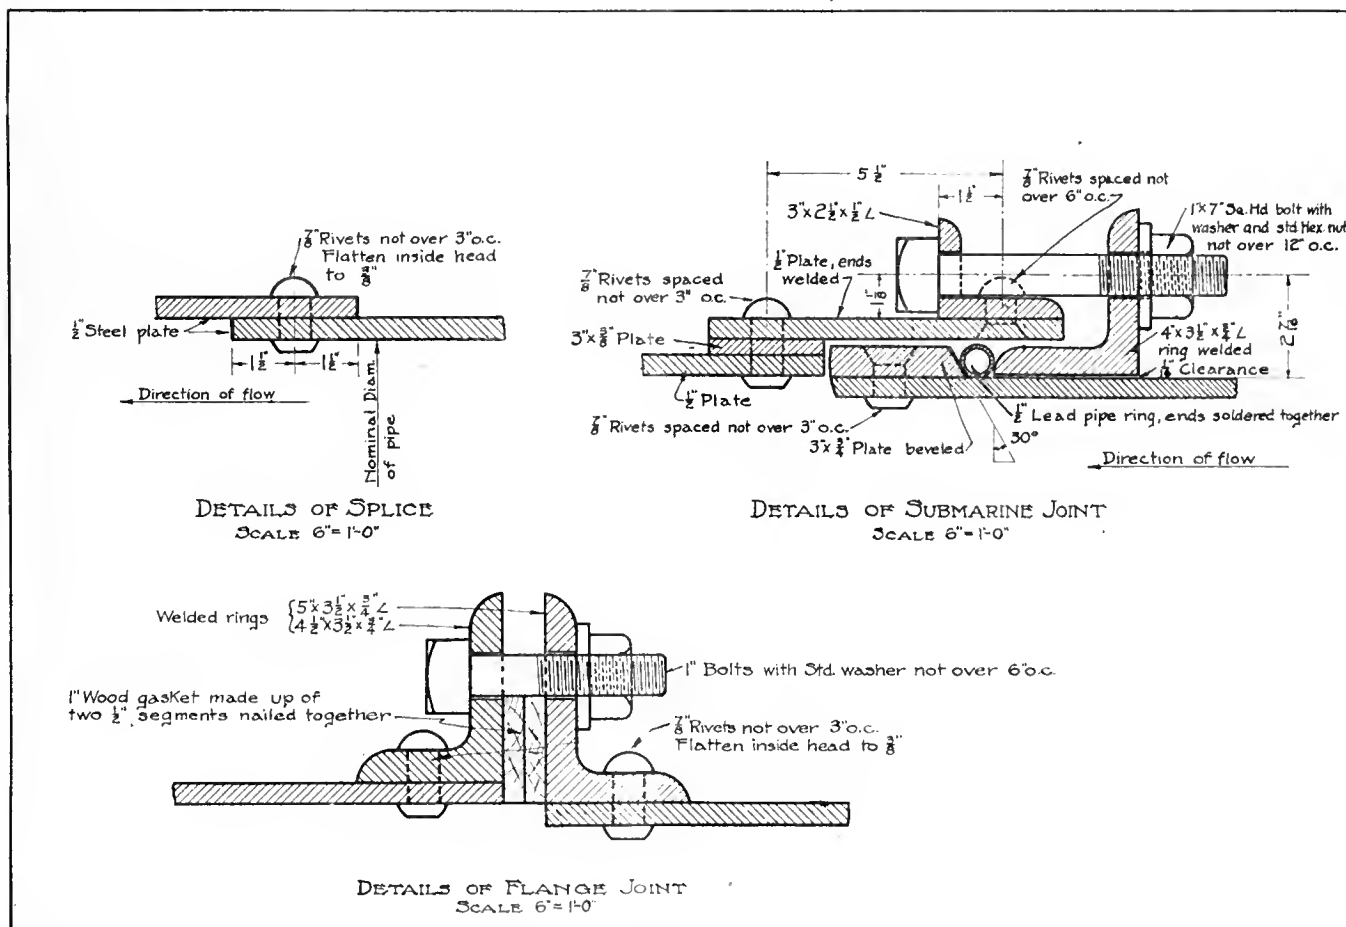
Details of 63-inch Riveted Steel Pipe.
